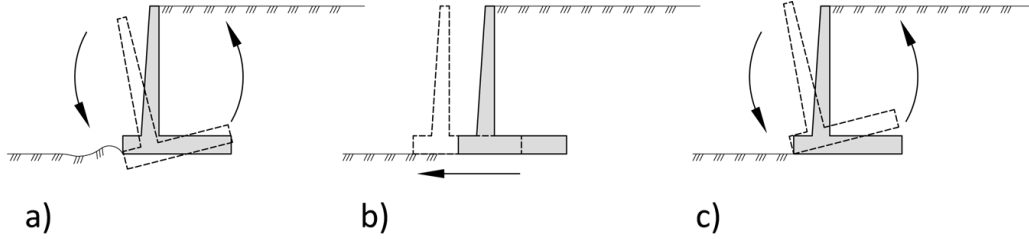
Common failure modes; a) bearing capacity failure b) sliding c) overturning
